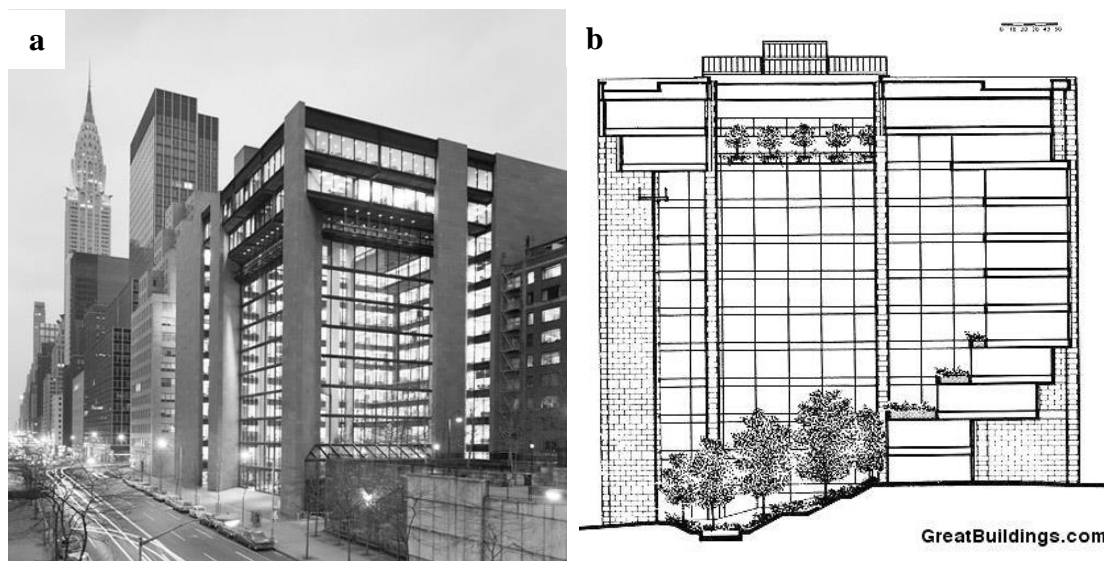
Section of Ford Foundation Headquarters Atrium, New York, New York, 1968
